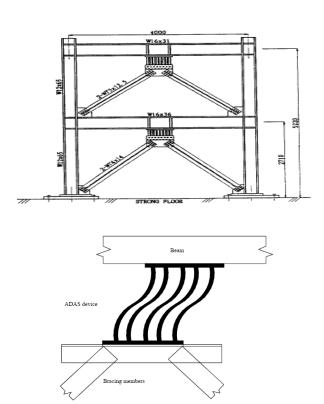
Typical metallic plate damper installation and ADAS devices deformation
